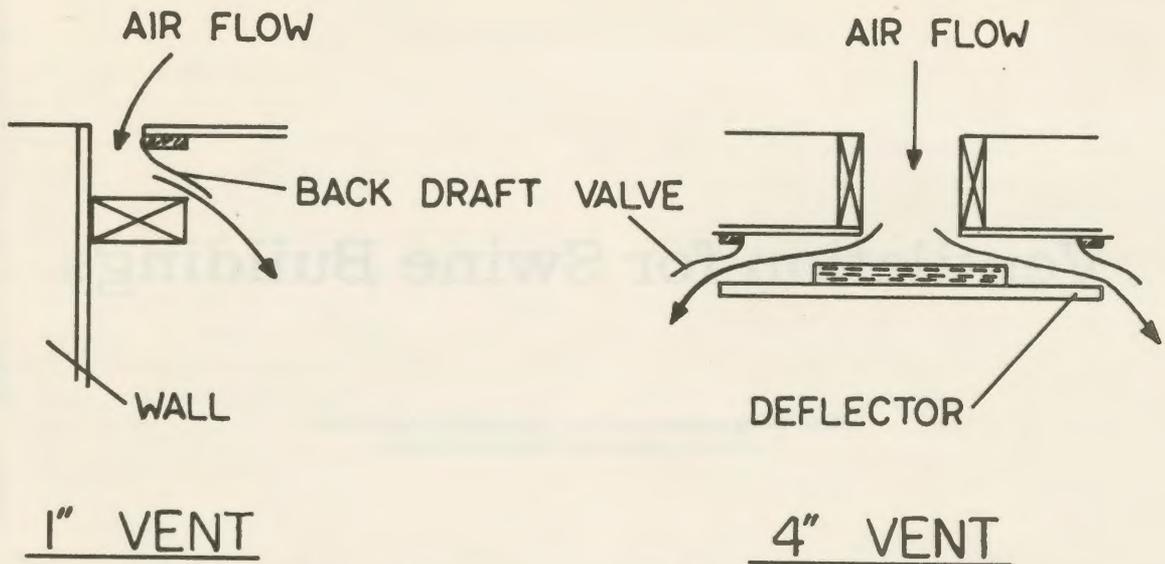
Slot intake construction in buildings up to 32 feet wide (left). Slot intake construction in buildings more than 32 feet wide (right).
